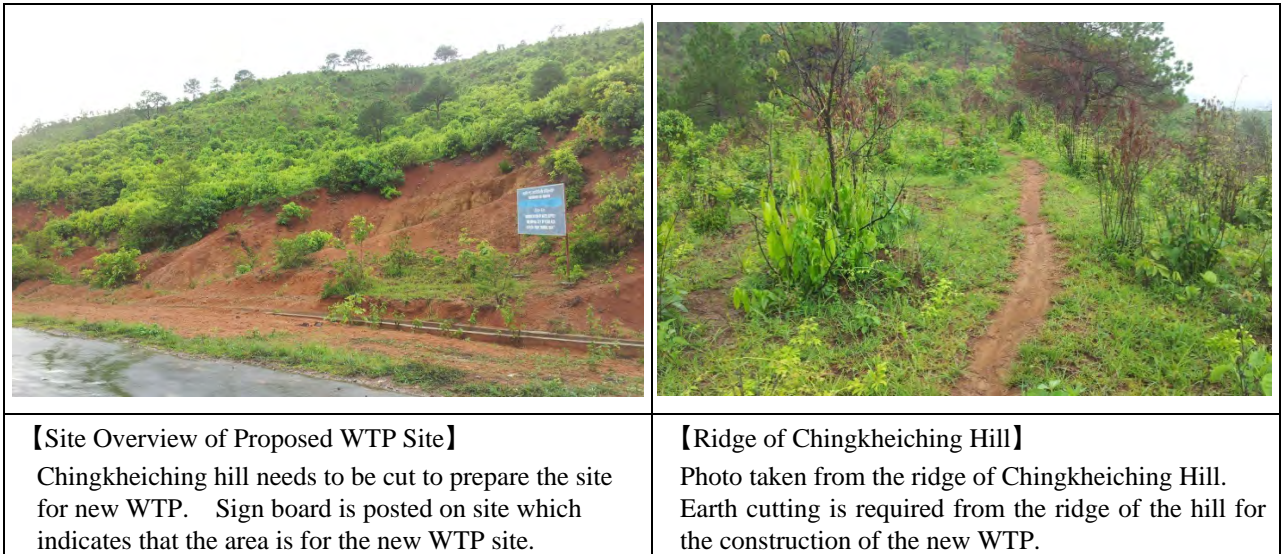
Proposed Construction Site of Chingkheiching WTP
